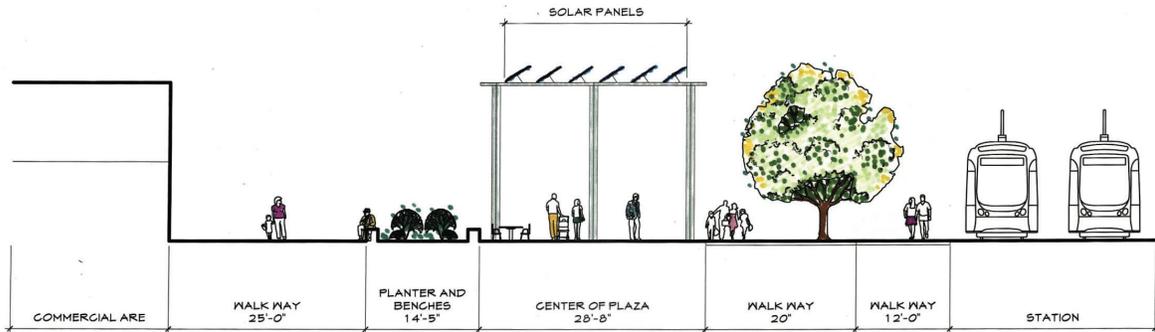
Section A from the rendered site plan (Figure 85), looking west.
